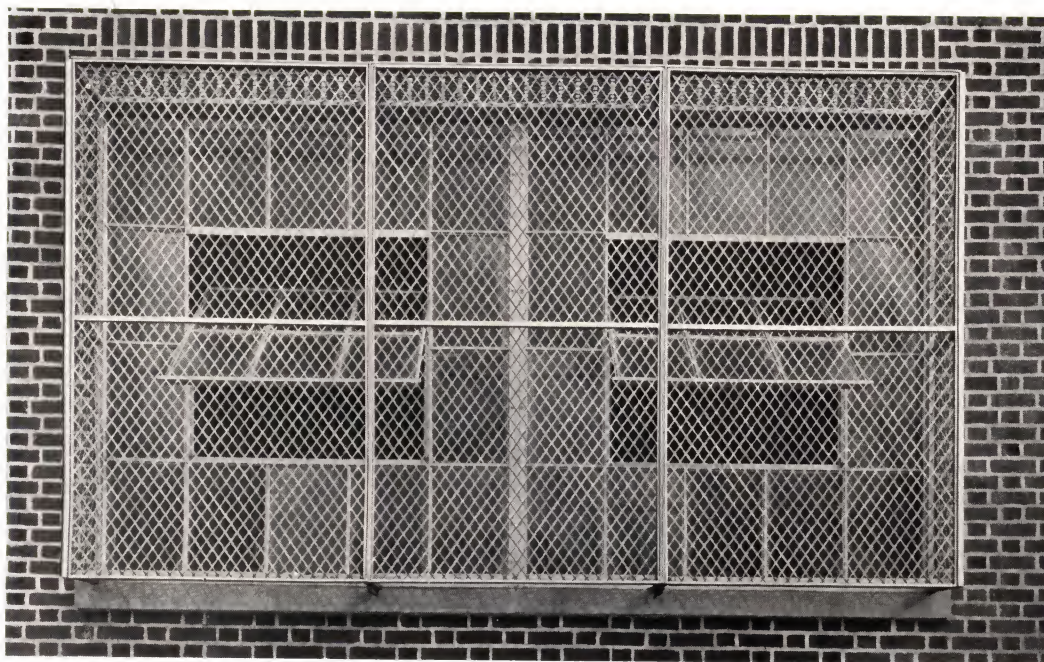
These illustrations show part of an installation of Horrocks Window Guards at the Department Street Cleaning, Housing Station, Brooklyn, N. Y.
